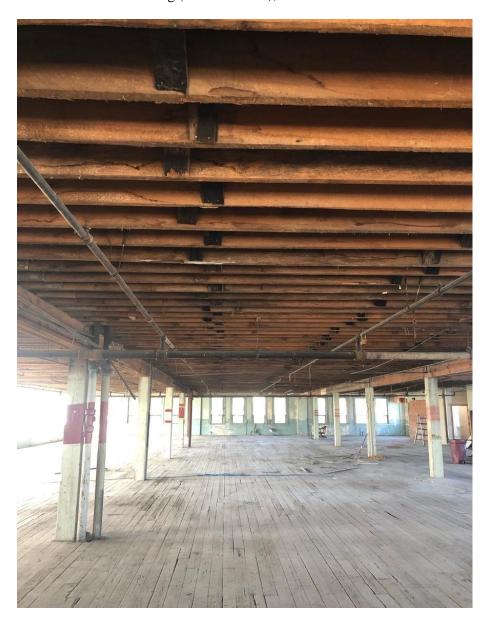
Fulwiler Building (159 Walnut St), Third Floor. View Southwest. March 24, 2021.
